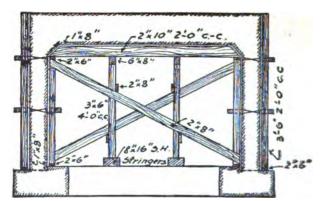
Section of Concrete Box Culvert, Showing Forms.
